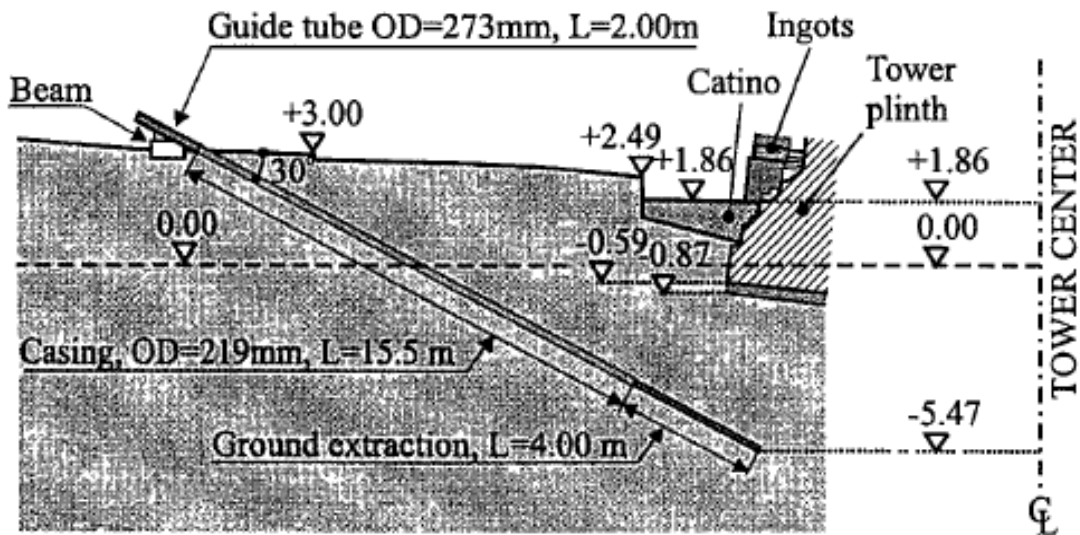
vertical section of the preliminary soil extraction (Burland, Jamiolkowski, & Viggiani, The stabilization of the leaning tower of Pisa, 2003)
